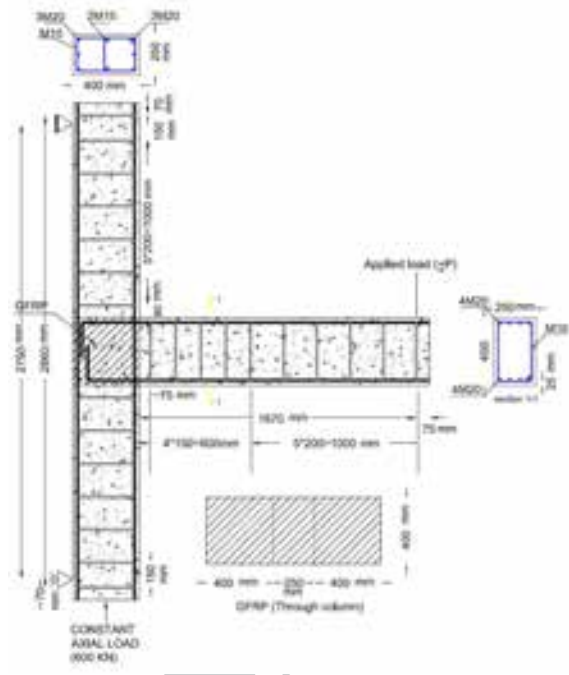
Specimen detail: plain FM2 and GFRP-retrofitted FM2-R
